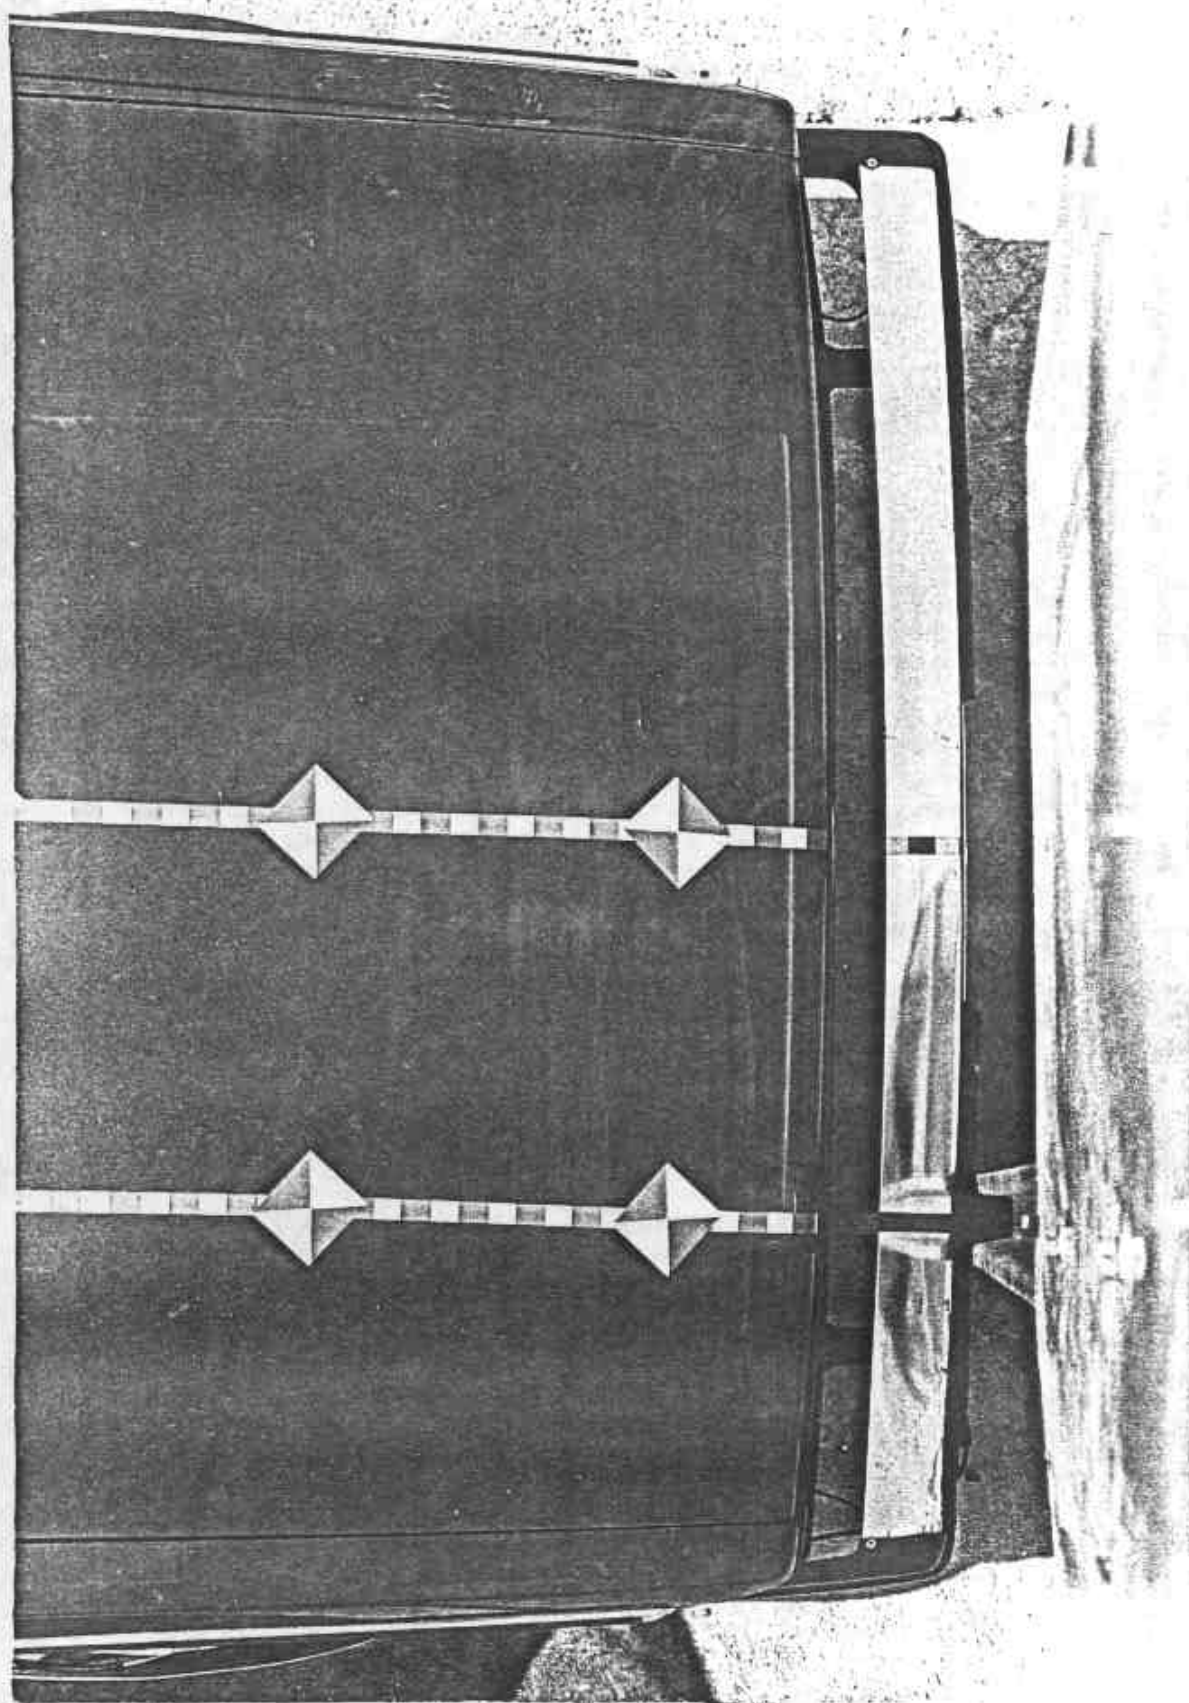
IMPACT LOCATION OVERHEAD VIEW - PRETEST
